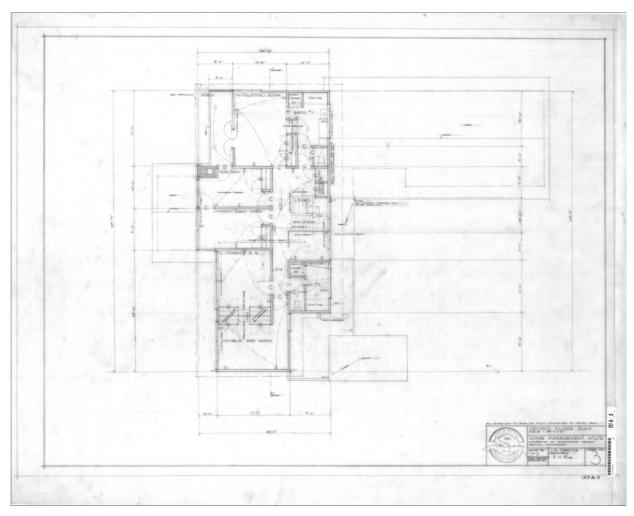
John R. Sproule's first floor plan for the Home Management House, courtesy of the UW Facilities Library.
